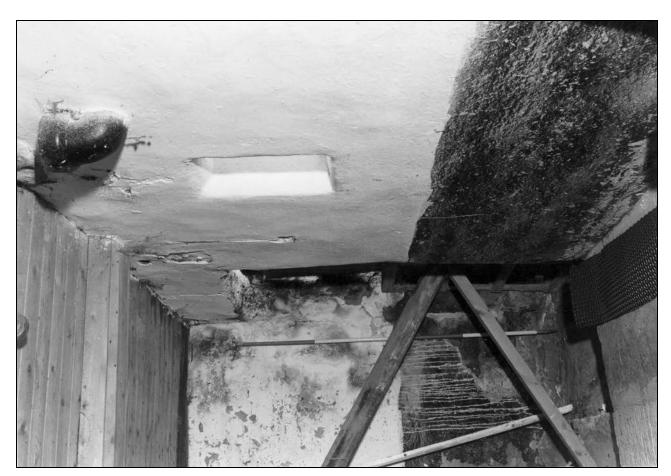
Interior view of doorway at north-east corner of the barn (film 3, frame 8)
